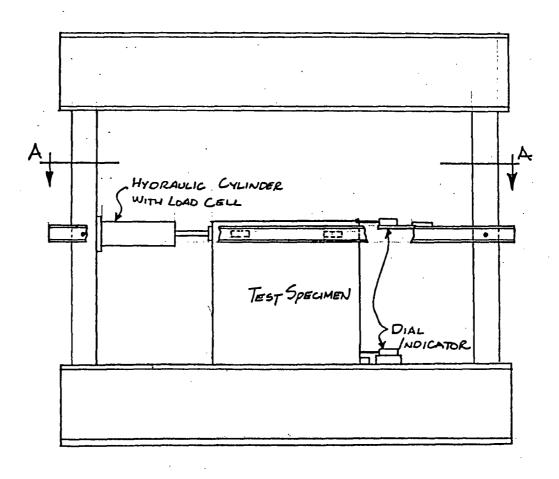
TEST FIXTURE WITH MOUNTED SPECIMEN (Uni-Directional Loading)
